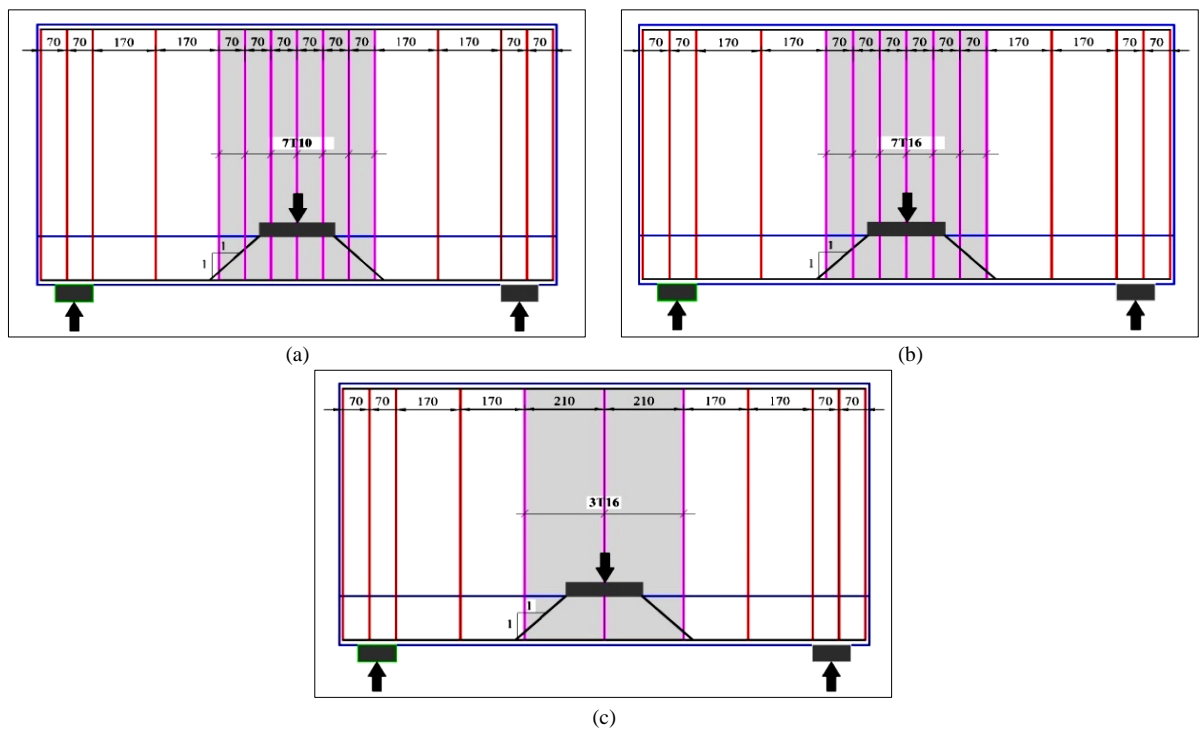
Reinforcement details for specimens with variable web shear reinforcement
